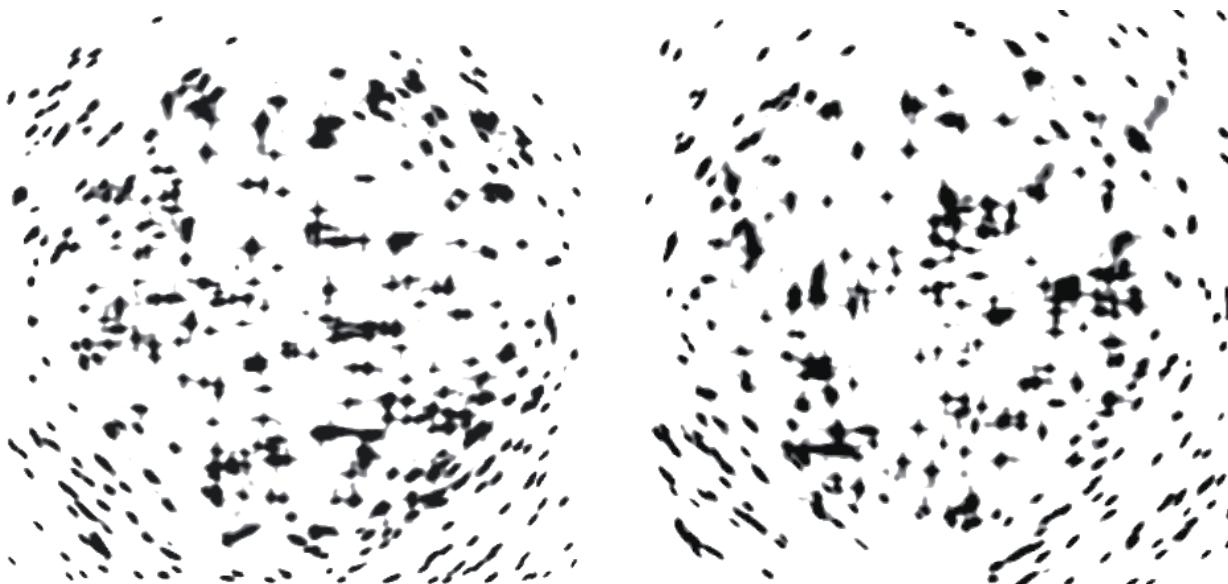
2D images of sections of concrete C4 beam located at 400 mm and 550 mm from its surface
